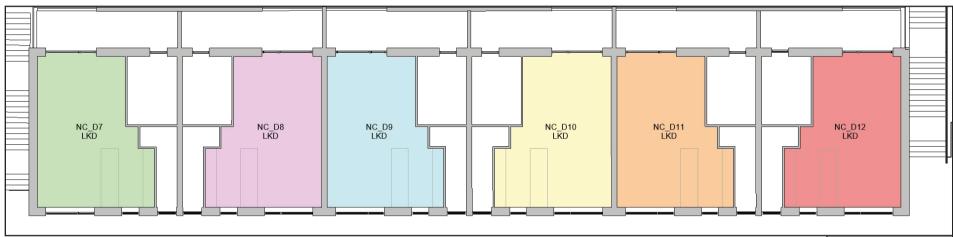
Floor plan of assessed building with keyplan highlighting the assessed building.
